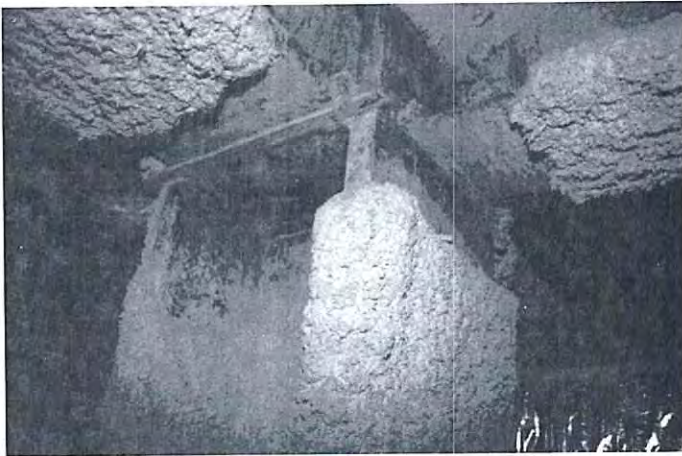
The fireproofing on this moment connection was removed to facilitate an Engineering Evaluation of a five-story steel-frame building.
